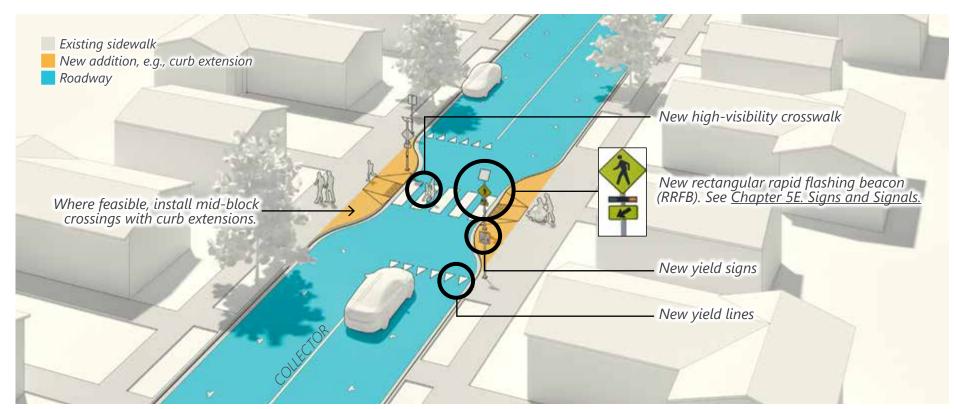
New Mid-Block Crossing and Flashing Beacons across a Collector Street.
